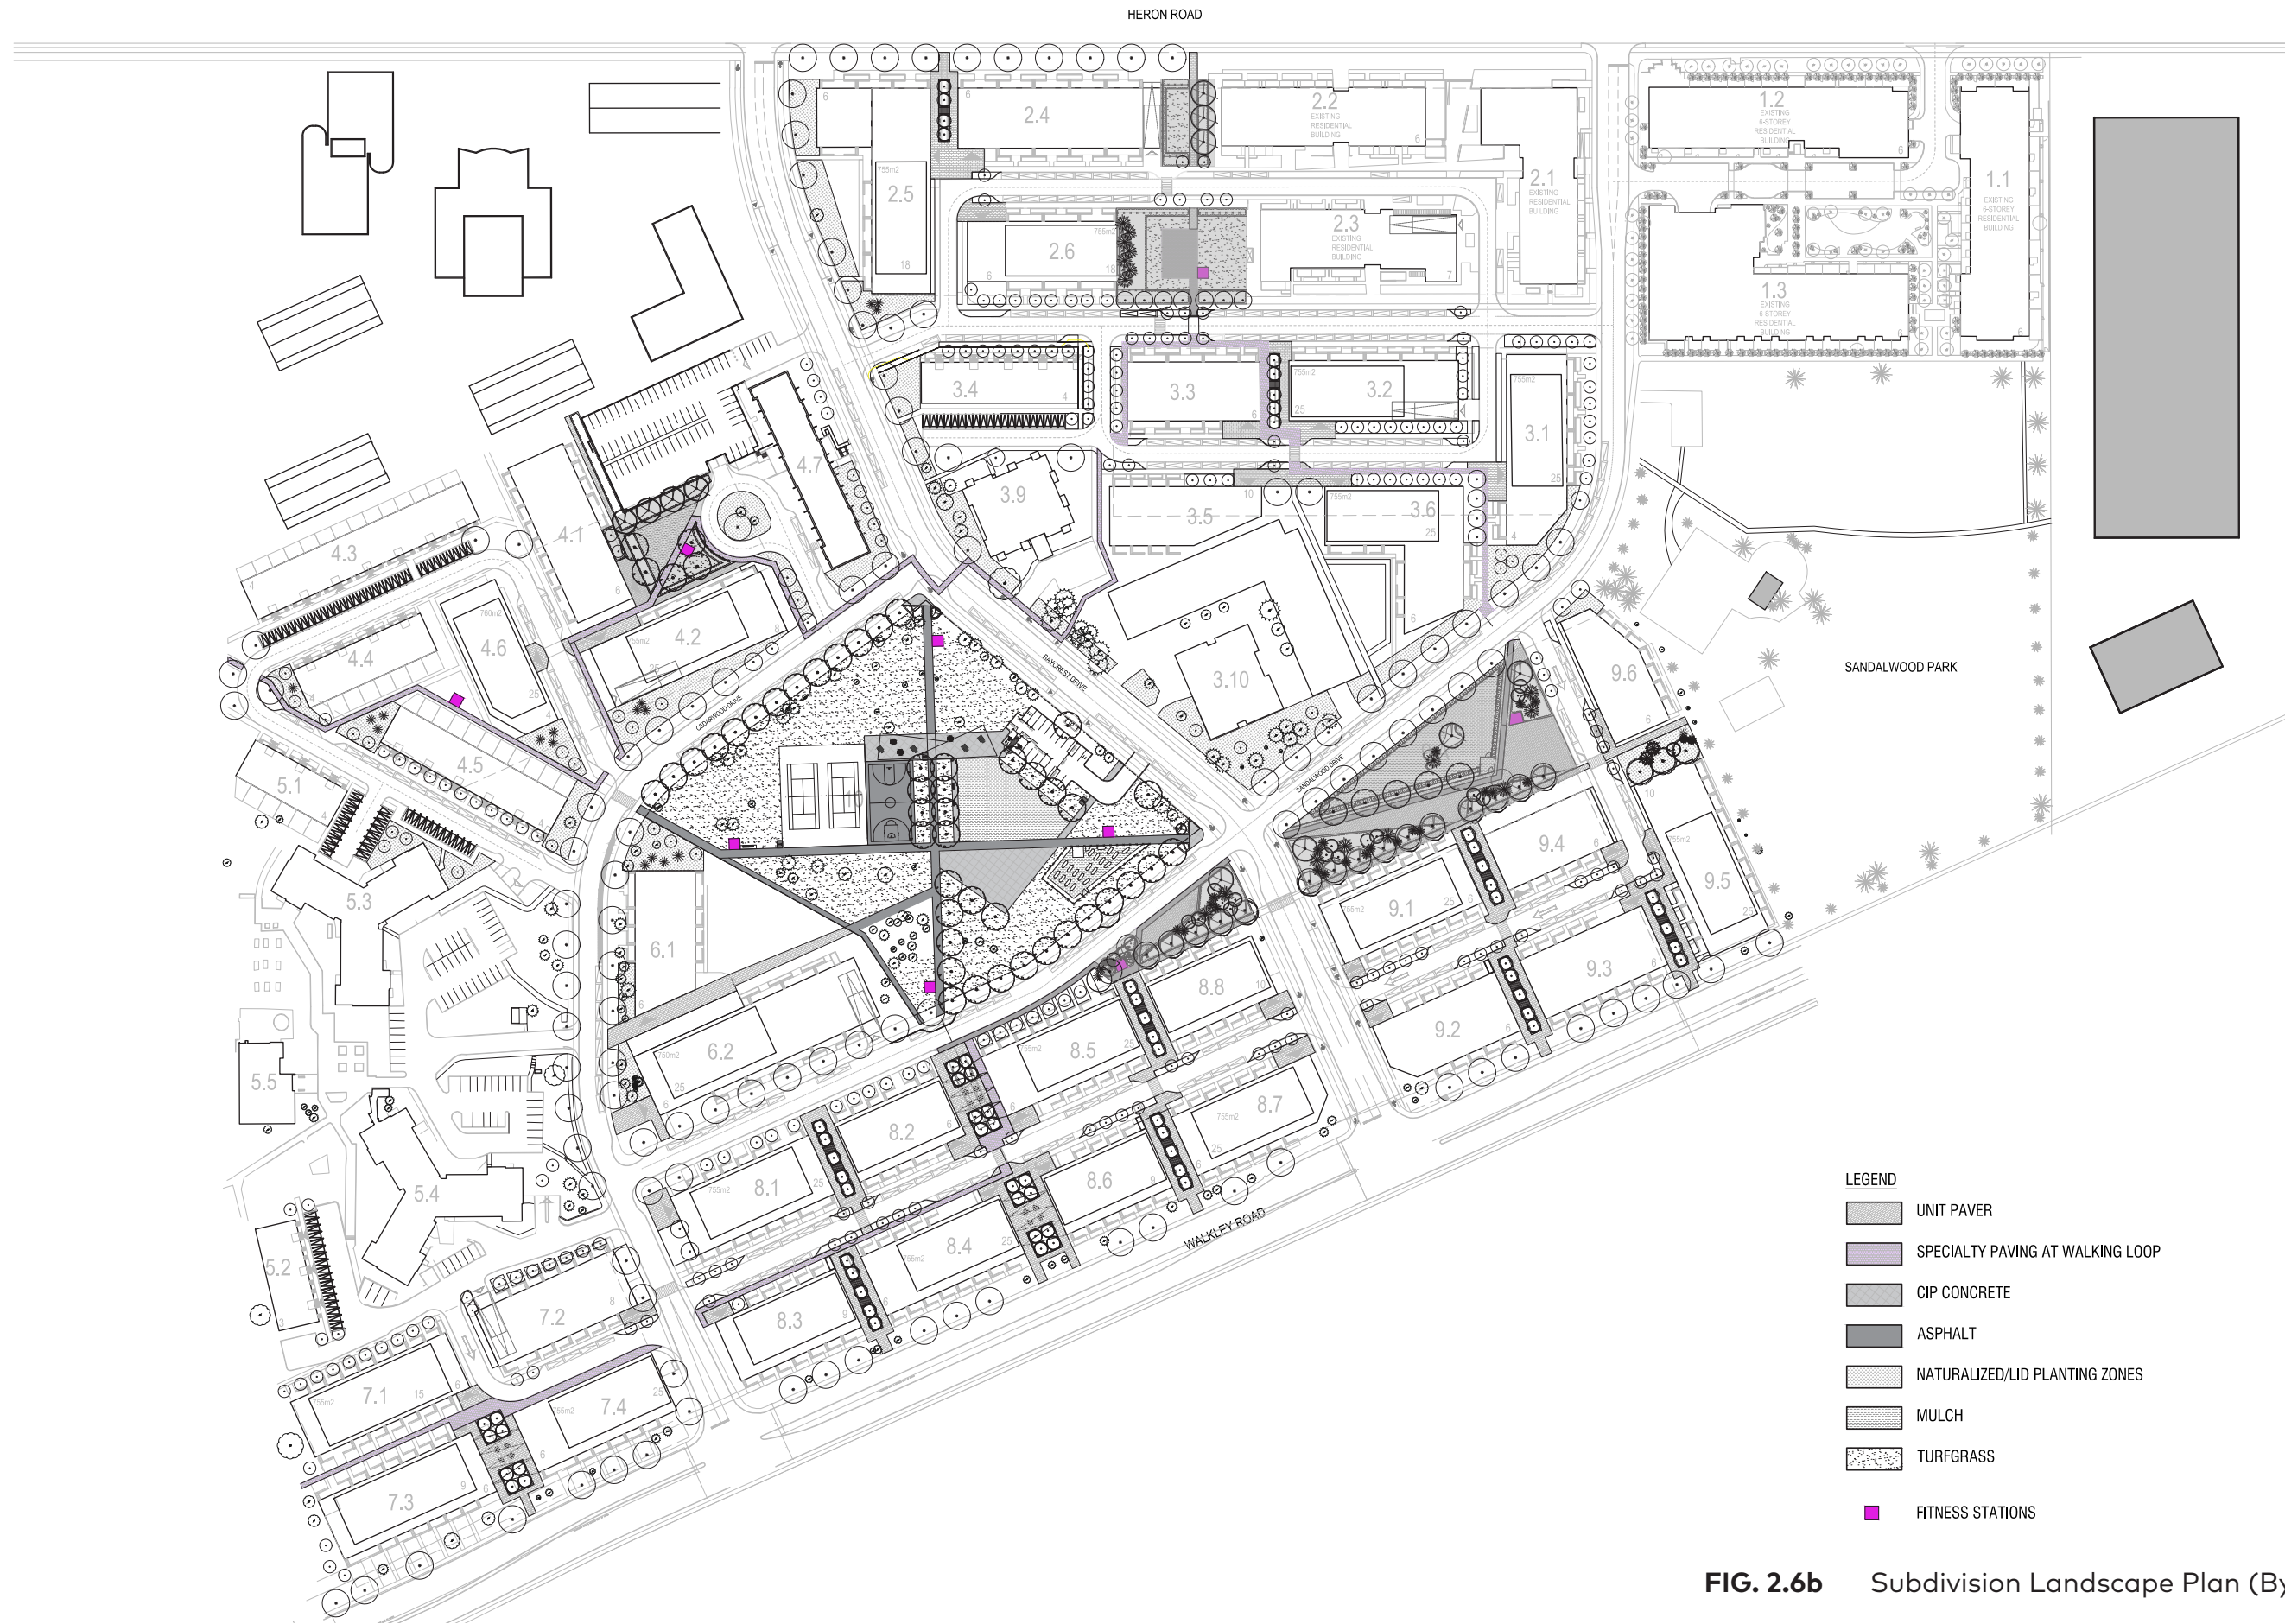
Subdivision Landscape Plan (By Fotenn)
